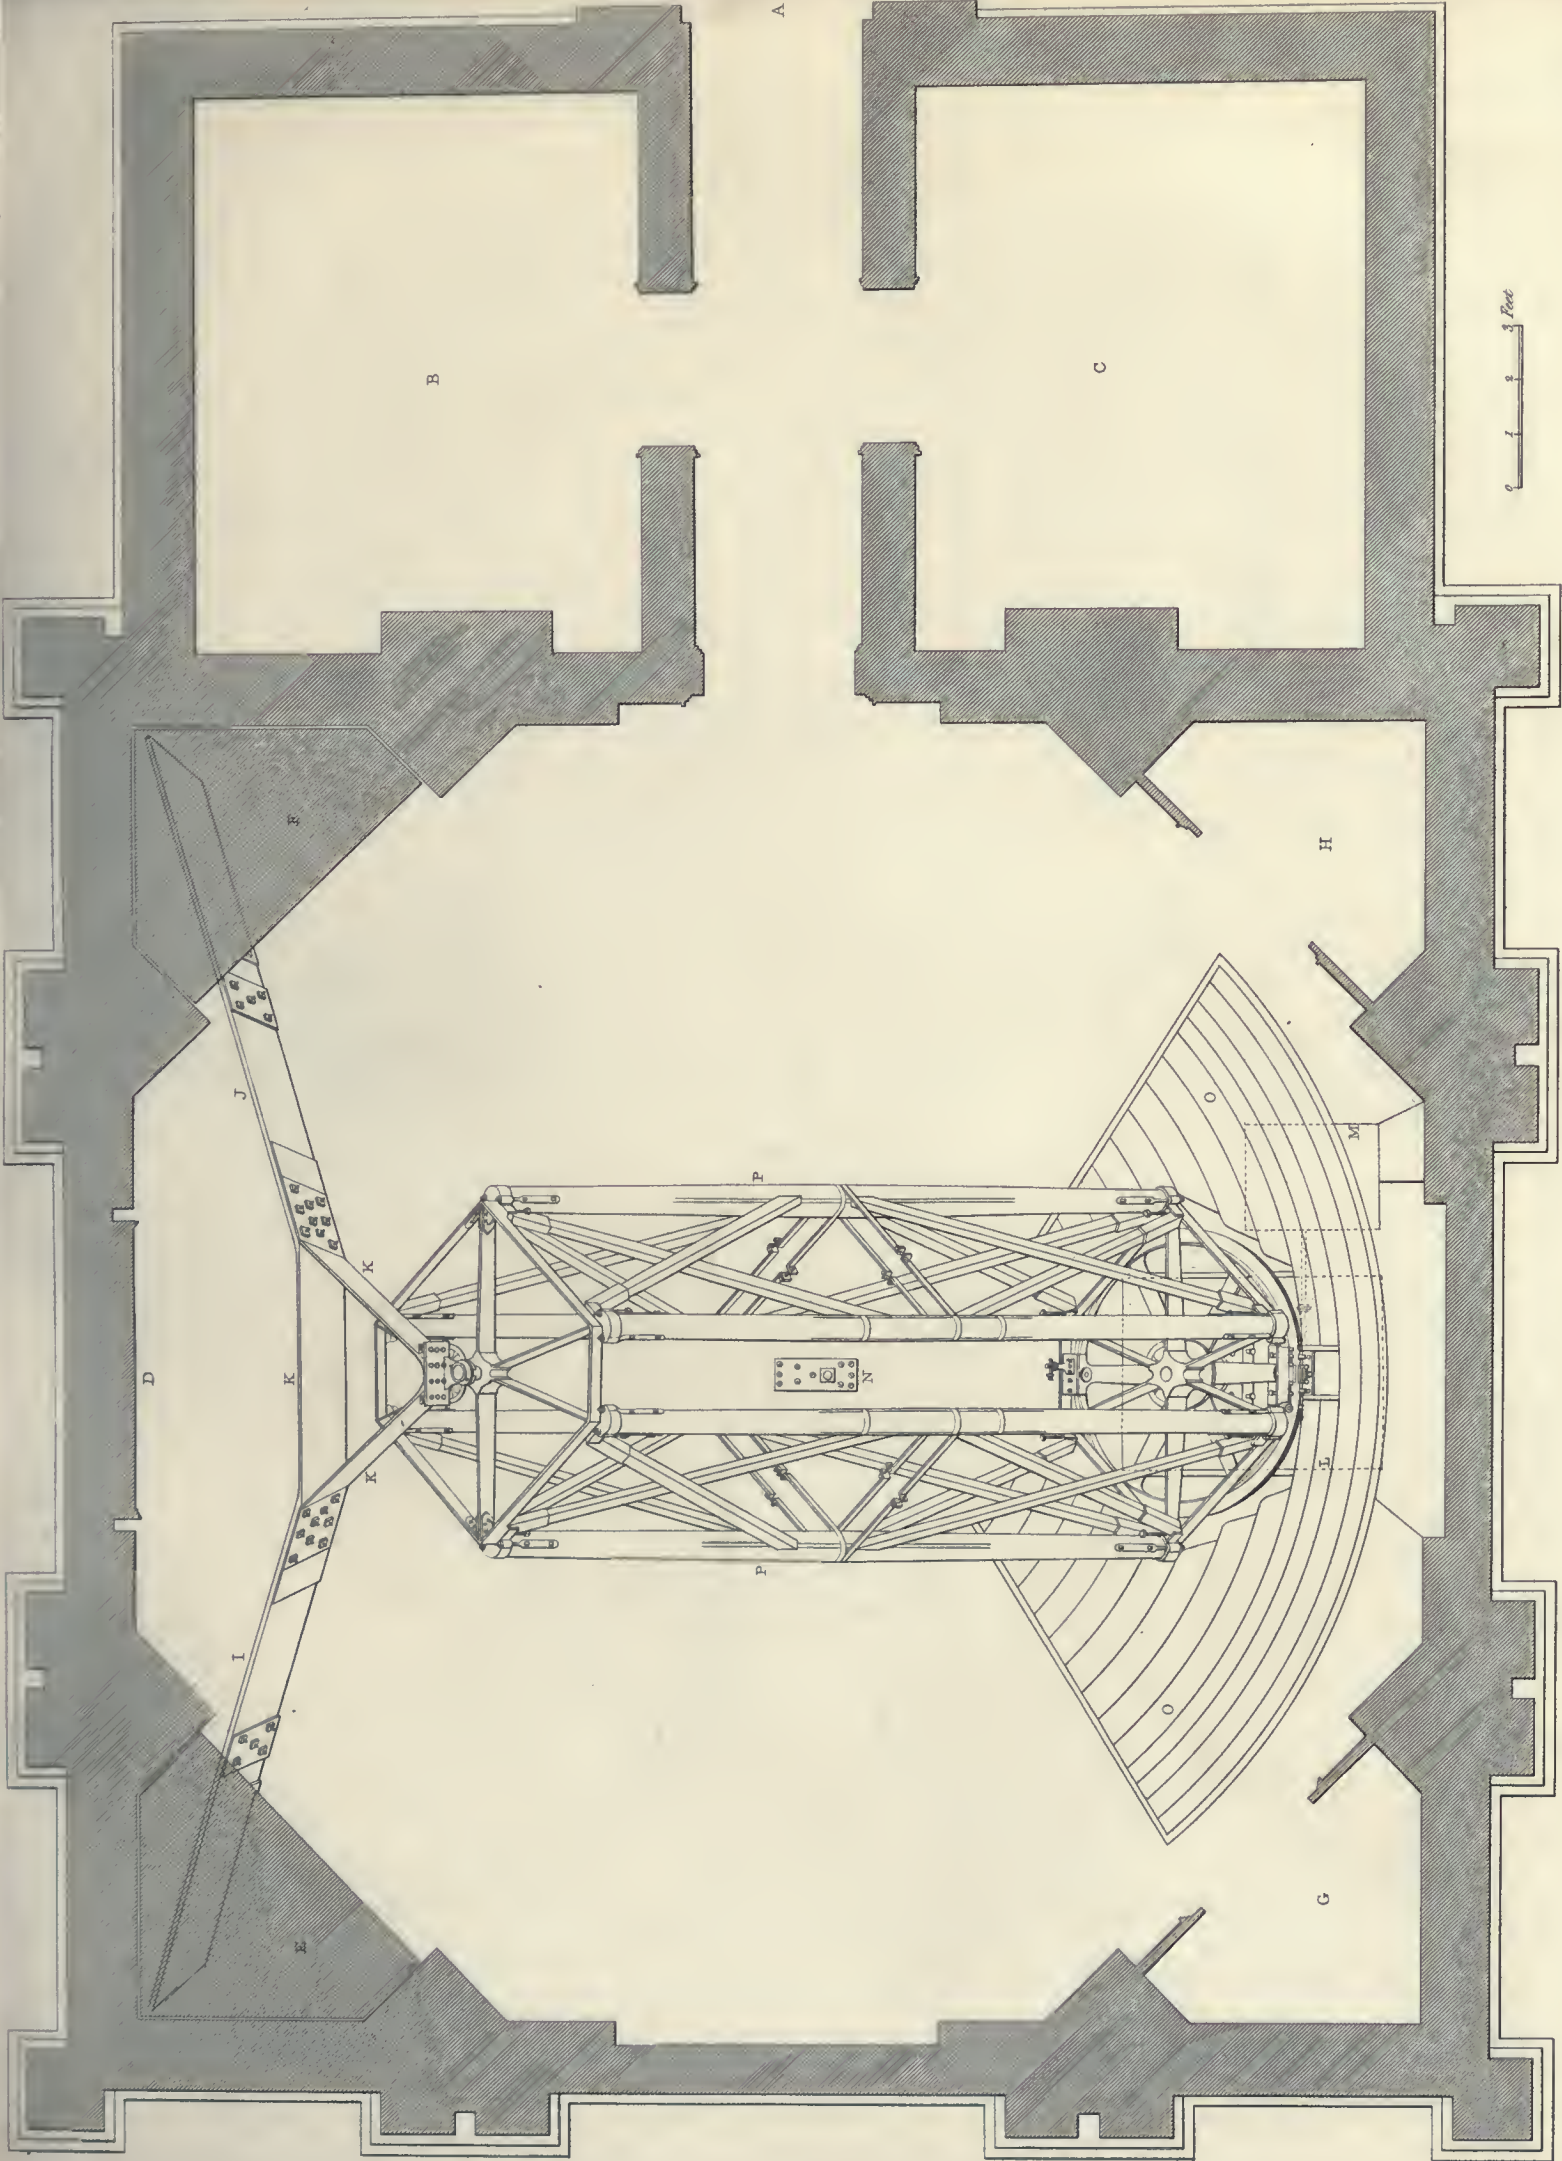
Ground plan of walls, piers, and polar-frame.
